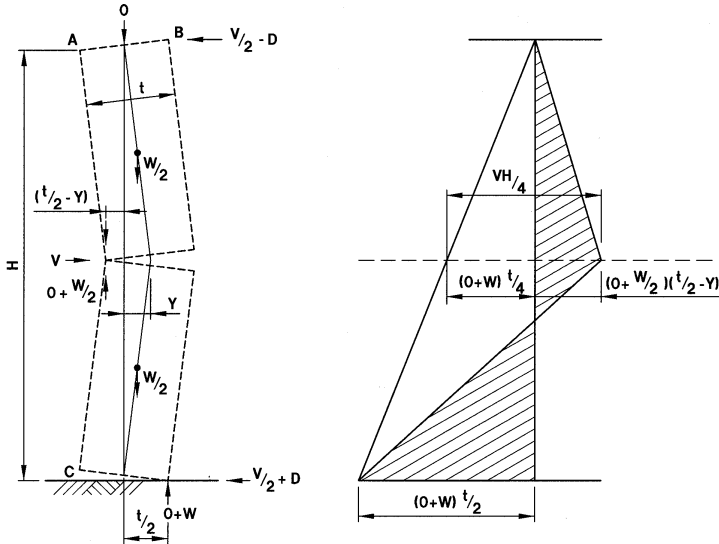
Behaviour of face loaded wall under static loading - a) forces assumed to act on the wall and - b) wall bending moment distribution.
